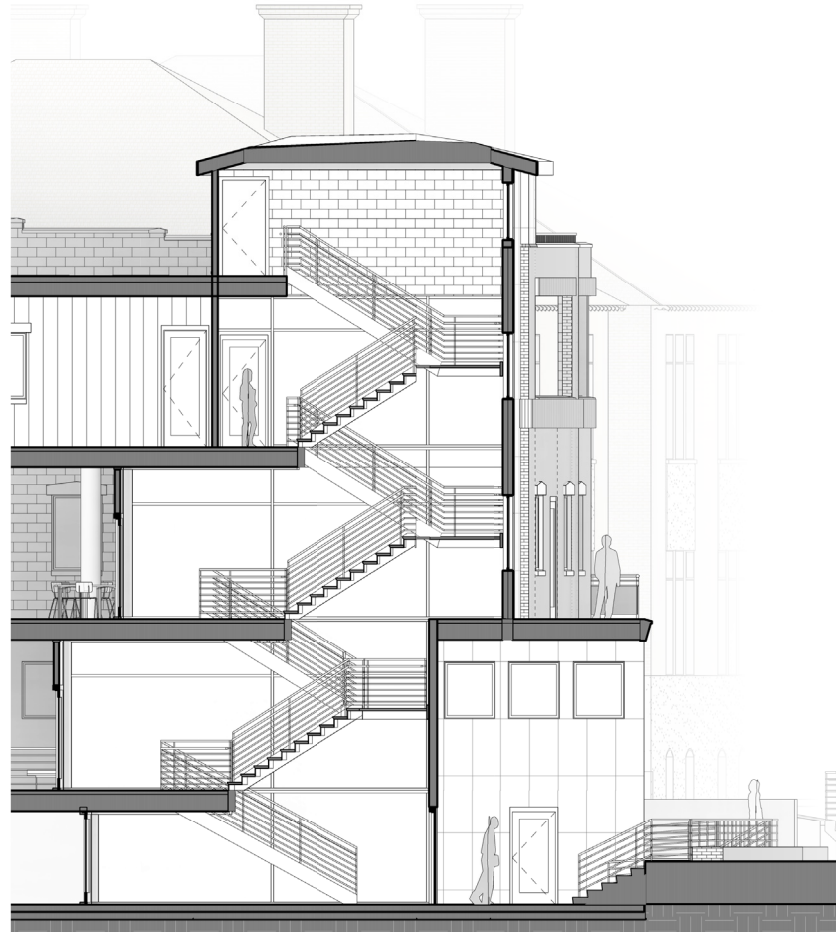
shows a section cut through the new stairwell on the southwest corner of 1021 Prince Street.
